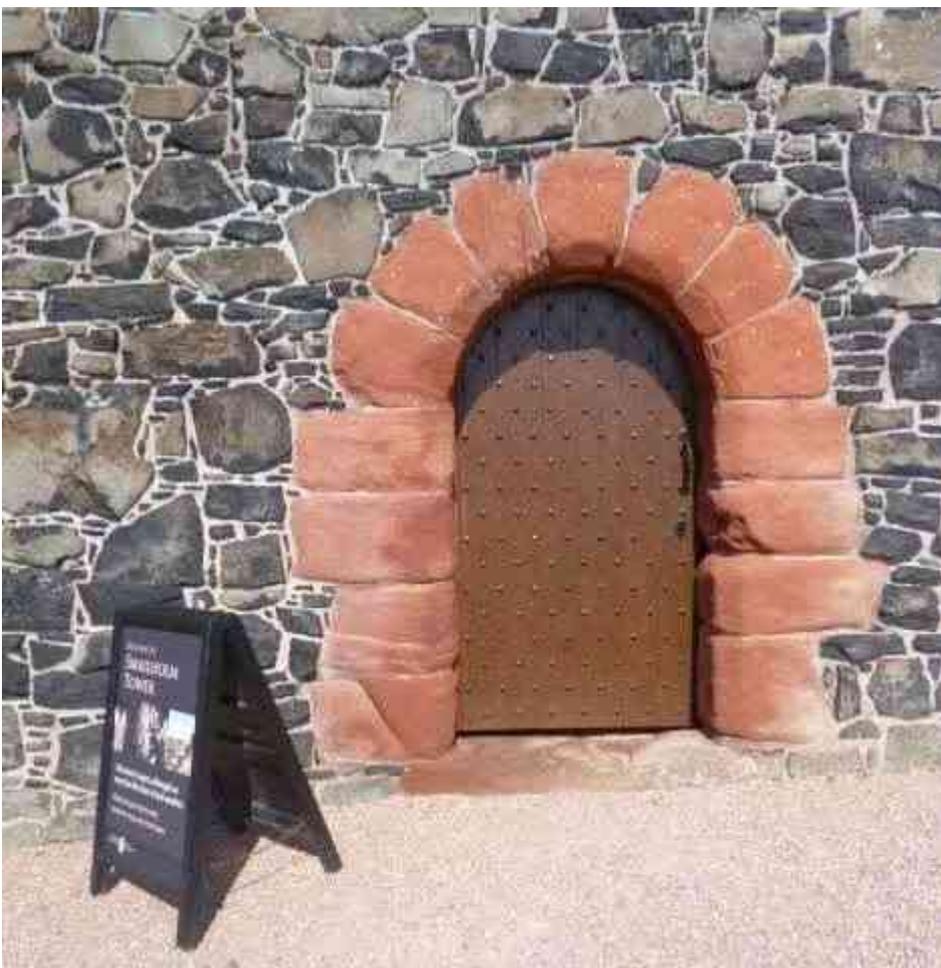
Doorway to the tower, to show use of basalt for walling and local red sandstone for quoins.
